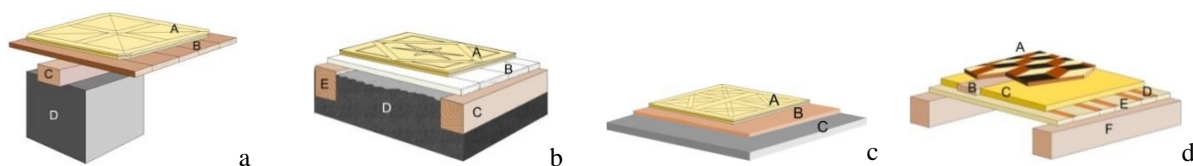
Diagram of floor construction: in the Przewrotne Manor House (a: A – panel, B – boarding/decking, C - ceiling beams, D – bricked post), in the Ball Room of the Łańcut Castle (b: A – panel, B – boarding, C - beams, D – sand), in the Chapel of the Łańcut Castle (c: A - panel, B - sand, C - concrete) and in the Chinese Room of the Łańcut Castle (d: A – parquet, B – additional beams, C – layer of sand, D – boarding/decking, E - glued strips of cloth, F – ceiling beams).
